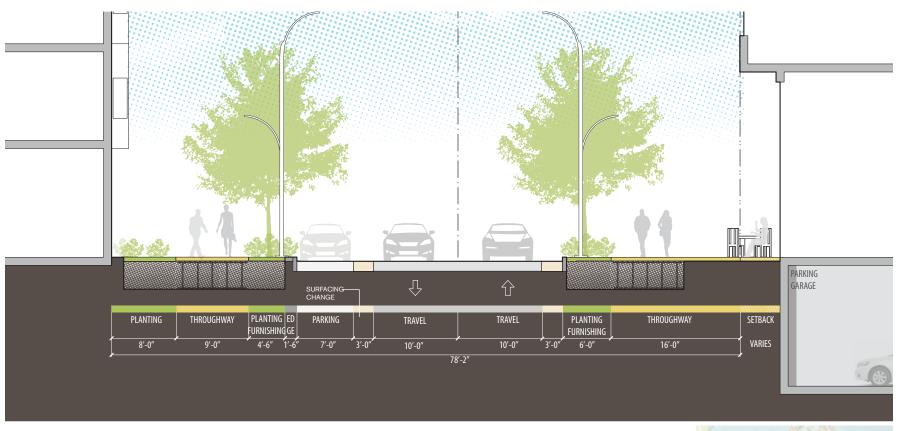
ARELIOUS WALKER STREET SECTION - TYPICAL
